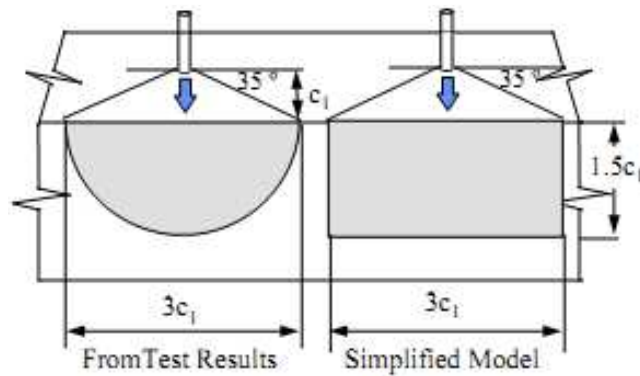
18 The simplified model for a single anchor subjected to shear loading
